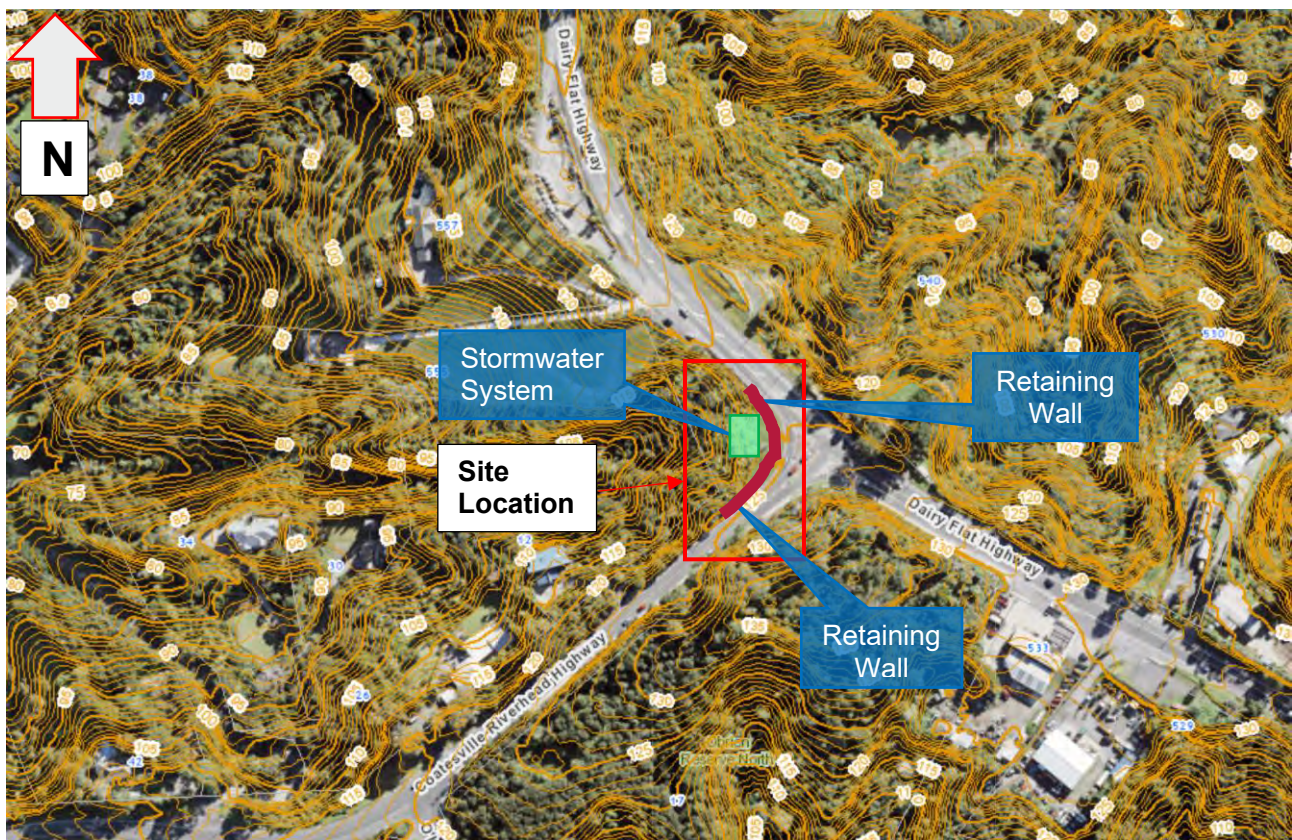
Aerial view of the site with contour of the existing ground with proposed stormwater system and retaining walls. (Auckland Council Geomaps).
